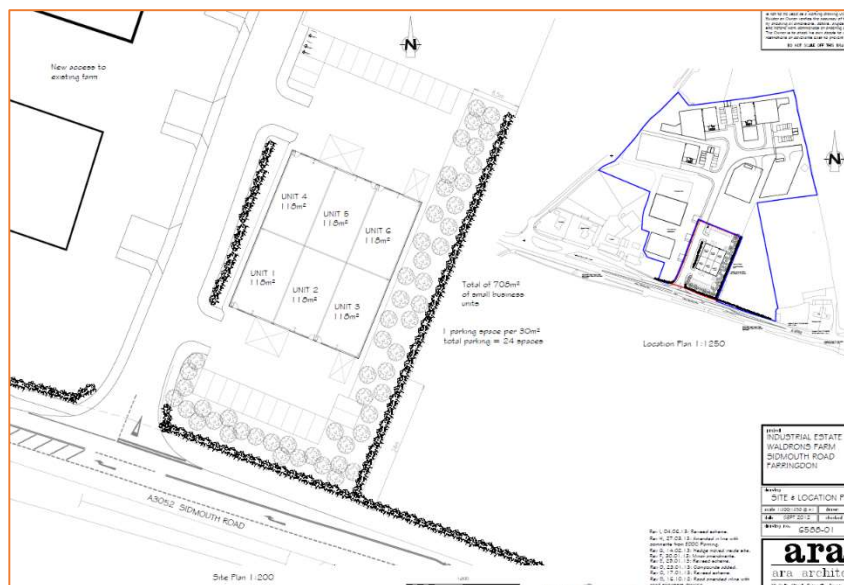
Site Plan for reserve matters planning consent ref: APP/U1105/A/14/2214150
